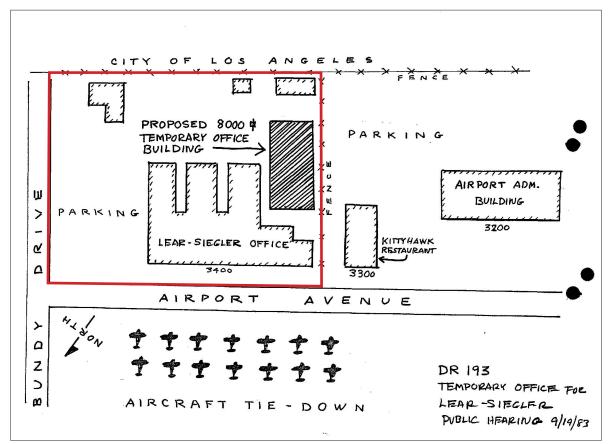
Site plan for 3400 Airport Avenue with red box indicating boundary of subject property. Note proposed temporary office building was not approved (City of Santa Monica, Building Permit, 1983).
